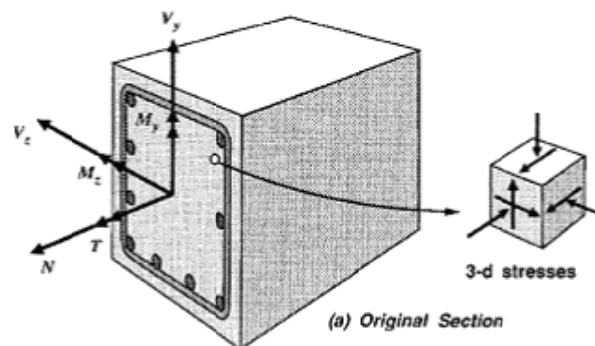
Stresses in cracked concrete (Vecchio and Collins, 1986).
